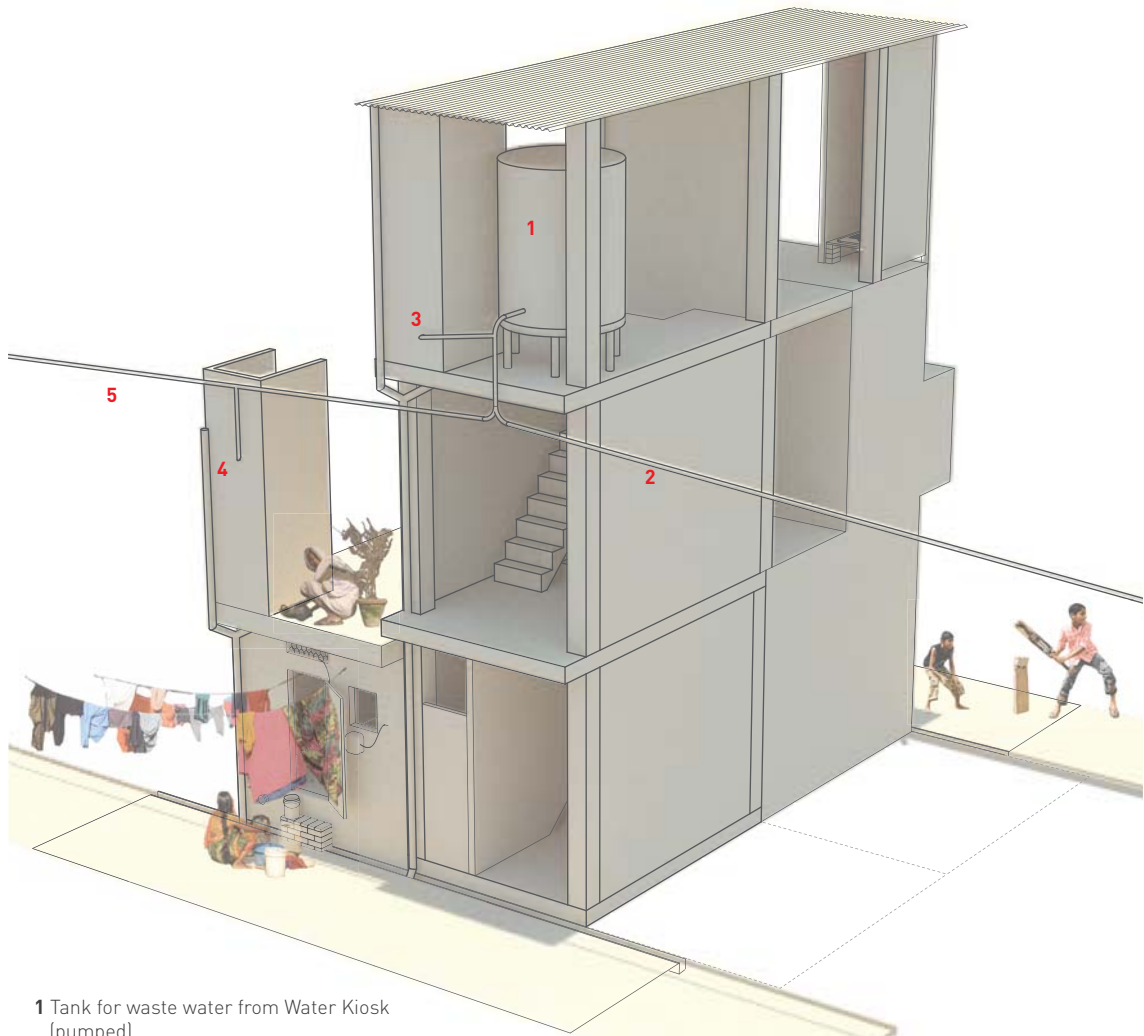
SECOND DESIGN: CORE HOUSE BUILD PROPOSAL.
